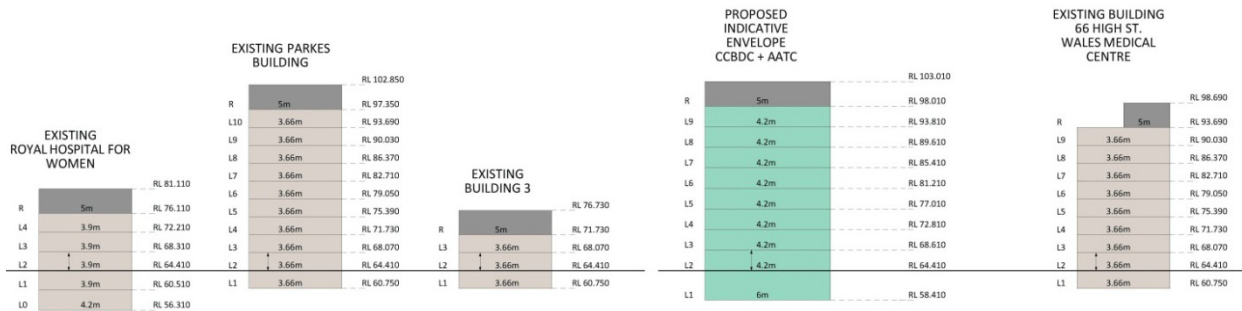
Proposed Stage 2 envelope in context to surrounding buildings
